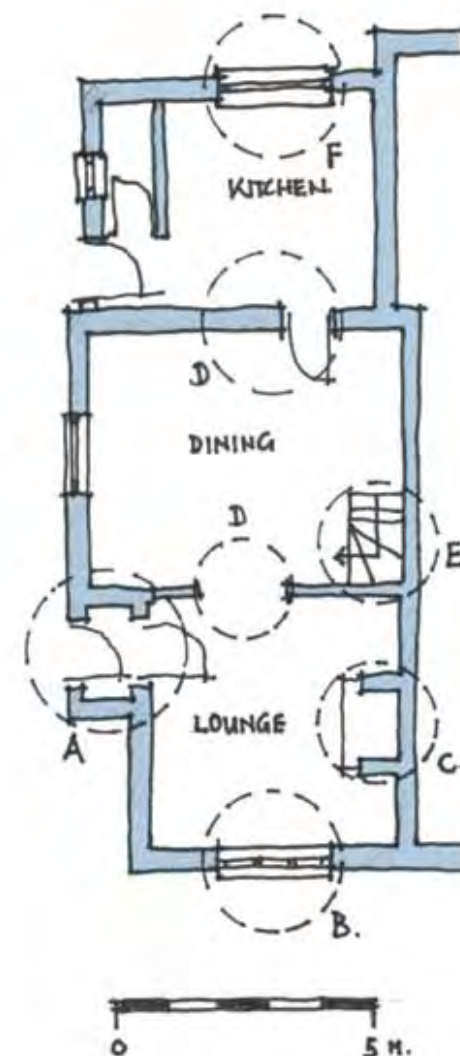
The plan form of an historic building is an important part of its special interest. Even the simplest and most humble of dwellings can have a plan form which is worthy of retention. The example shows a typical plan form of a modest estate cottage, examples of which are found across Central Bedfordshire.
